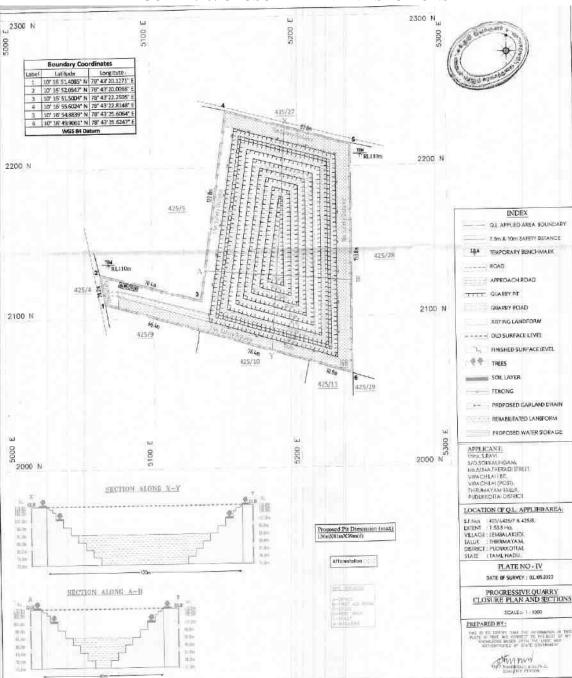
CLOSURE PLAN AND SECTIONS
